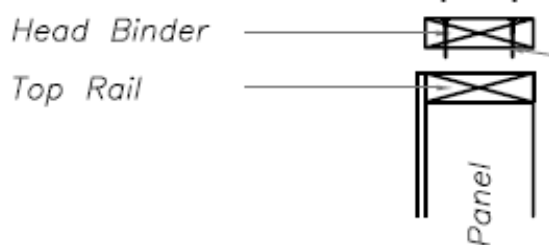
Connection between two horizontal timber members ©Robertson Timber Engineering
